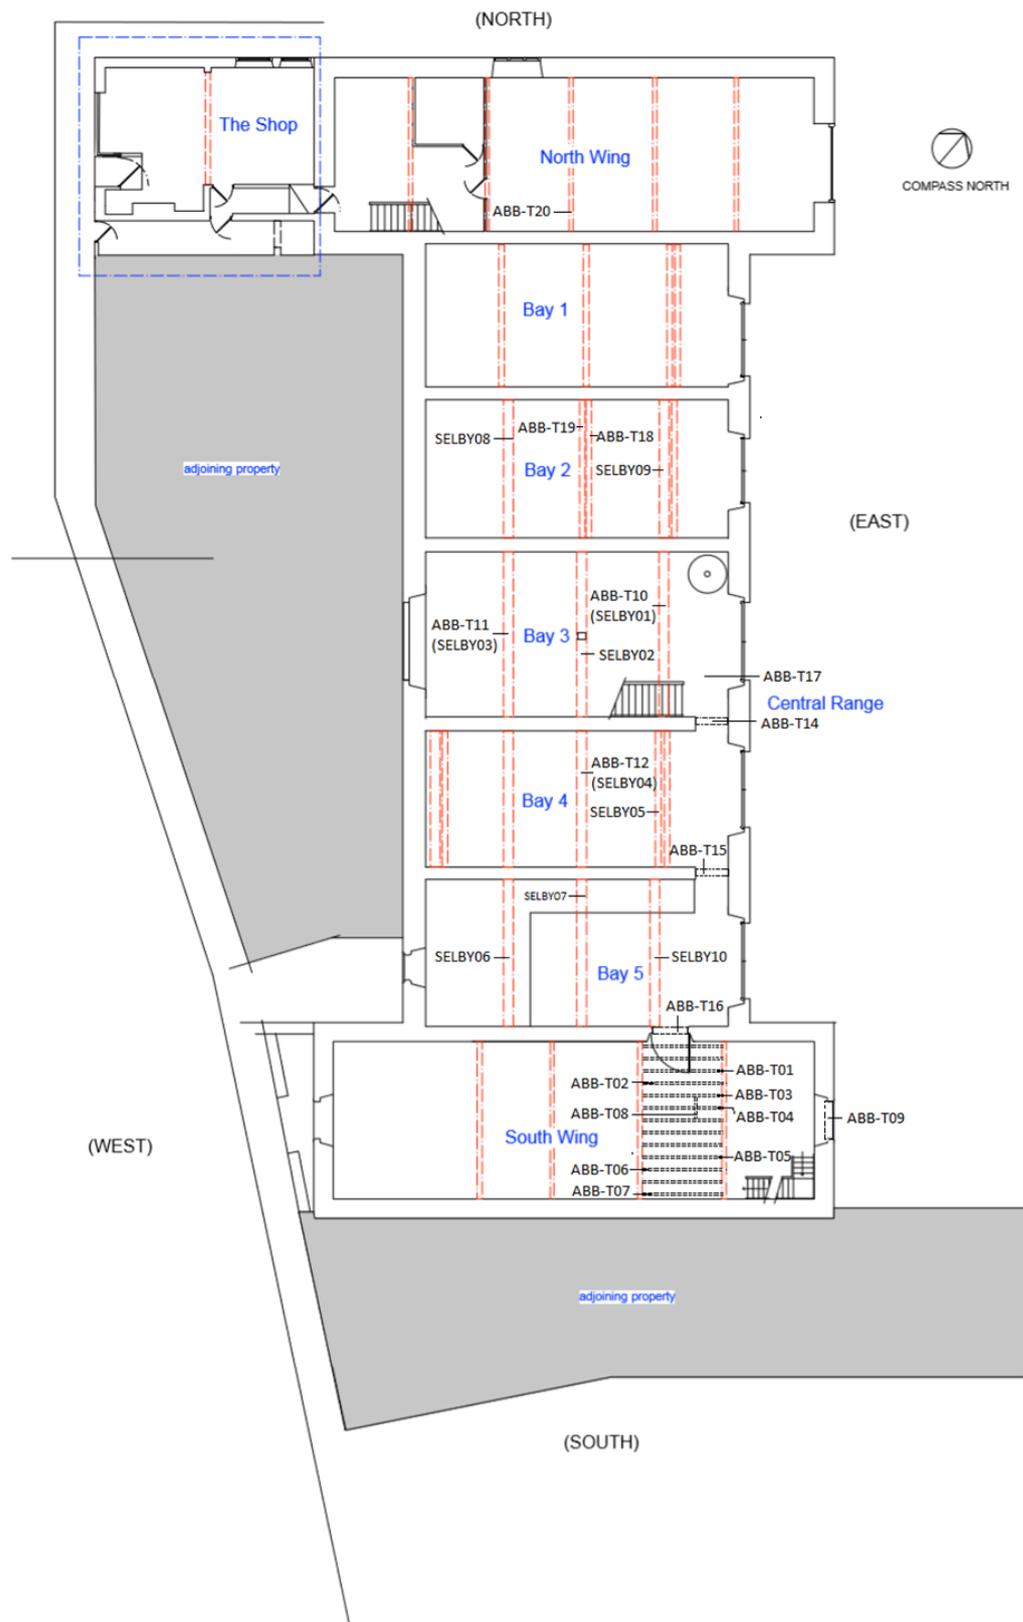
Ground-floor plan, showing sampled timbers, with exception of ex situ beam ABB-T13/SELBY11 (after Wiles & Maguire)
